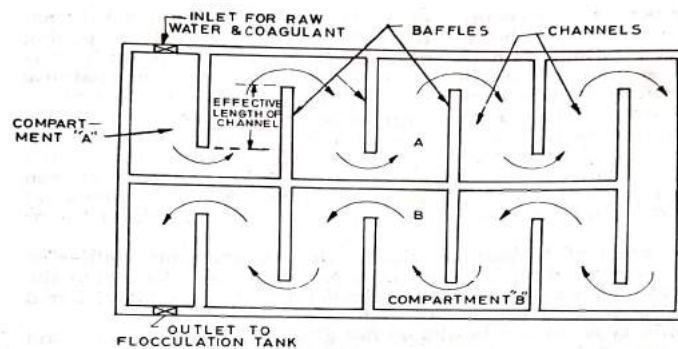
Plan of "Around the end baffle type" mixing basin.
